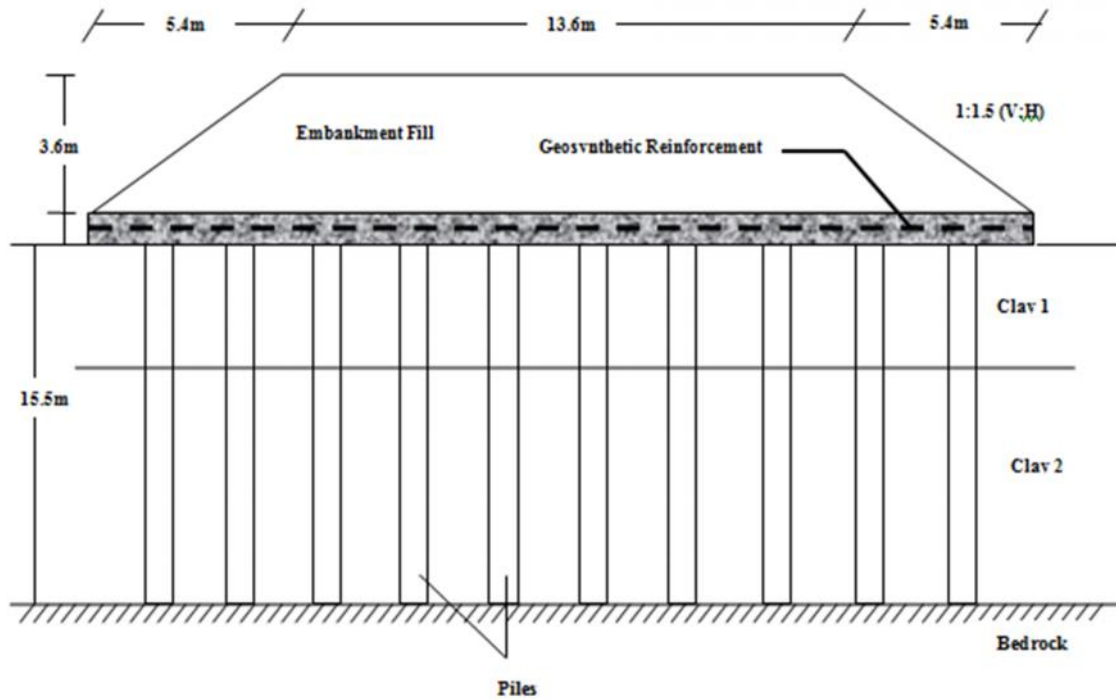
Cross-Section of the Embankment over a Soft Soil
